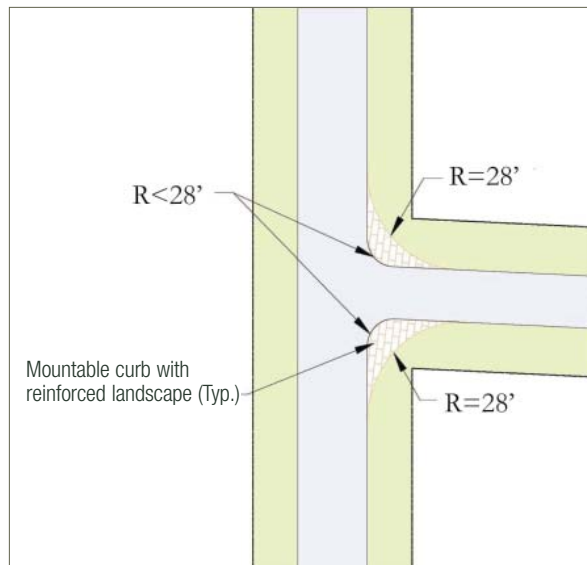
Curb design utilizing tight curb radii reduces pavement and calms traffic
